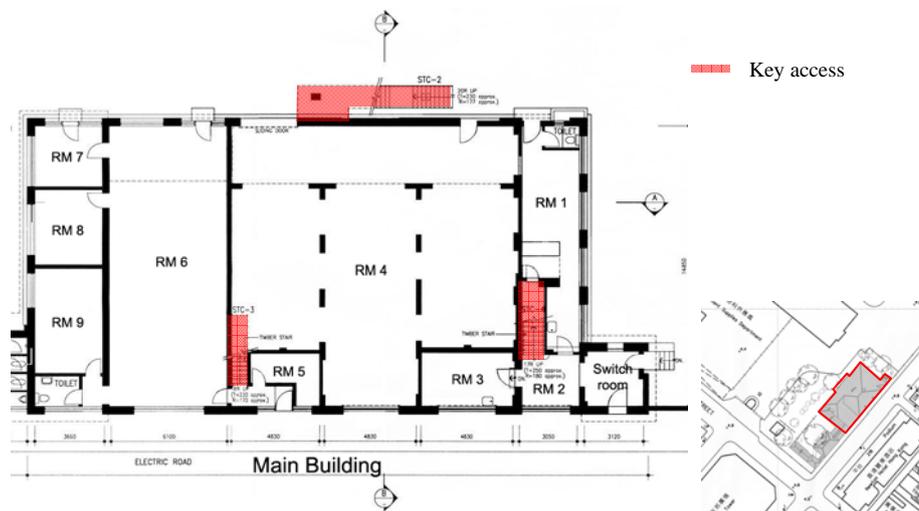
Existing ground floor plan of the main building at No. 12 Oil Street, North Point (1:400).
